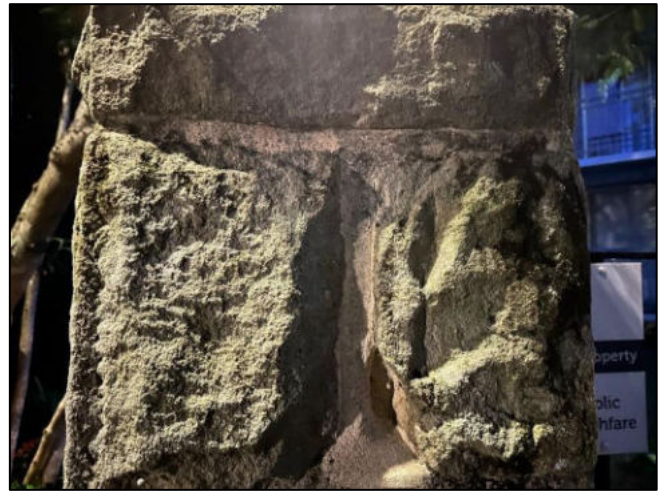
47 below show the Rohini gate posts located near King Street (Location 1), Cherry Street (Location 2) and in the Rohini Street cul-de-sac (Location 3). All three (3) sets of pillars are to be incorporated into the proposed Concept landscape scheme.
